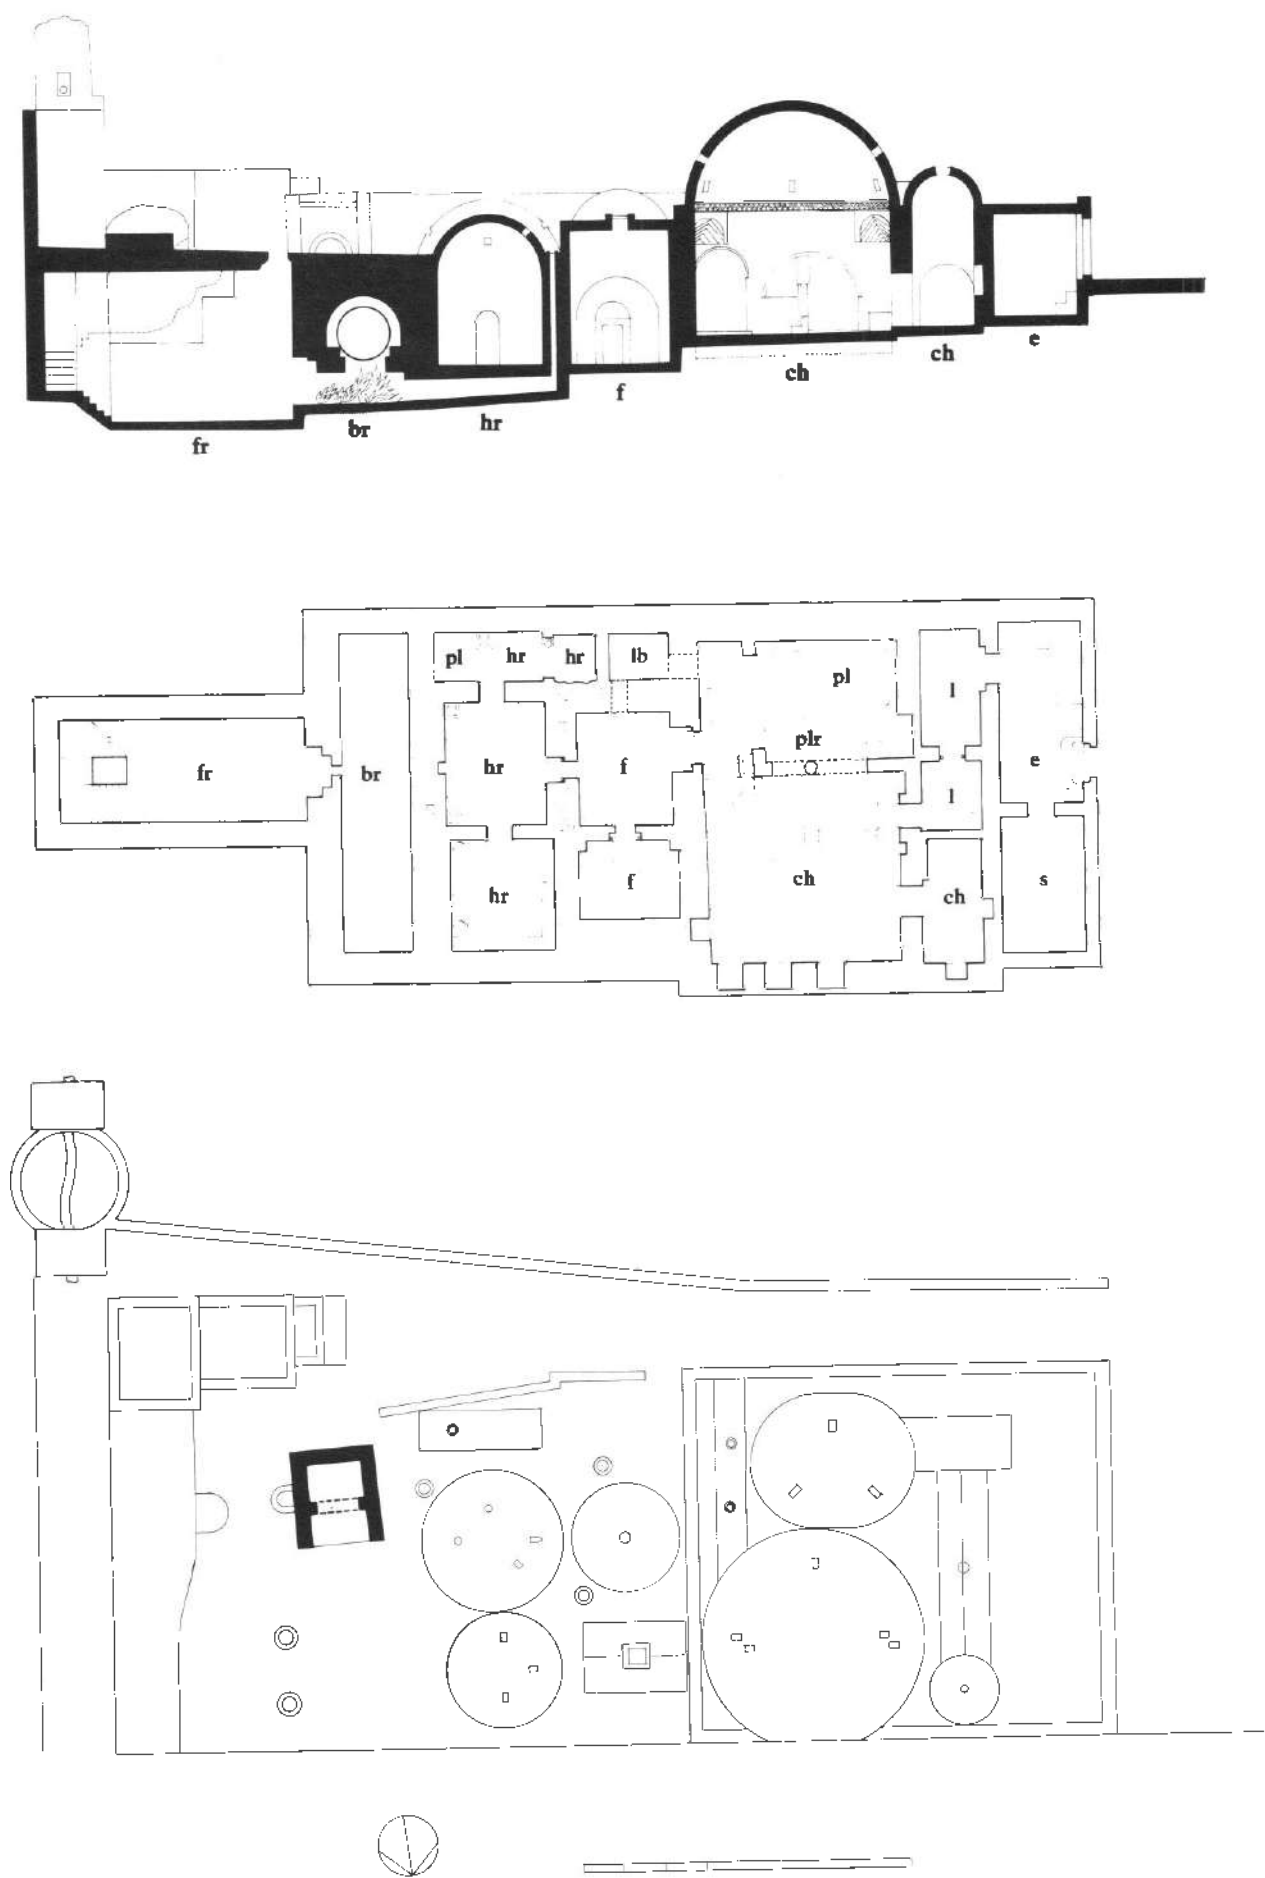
Hammām Yāsir. Ground plan, roof plan, and long section through the building.
